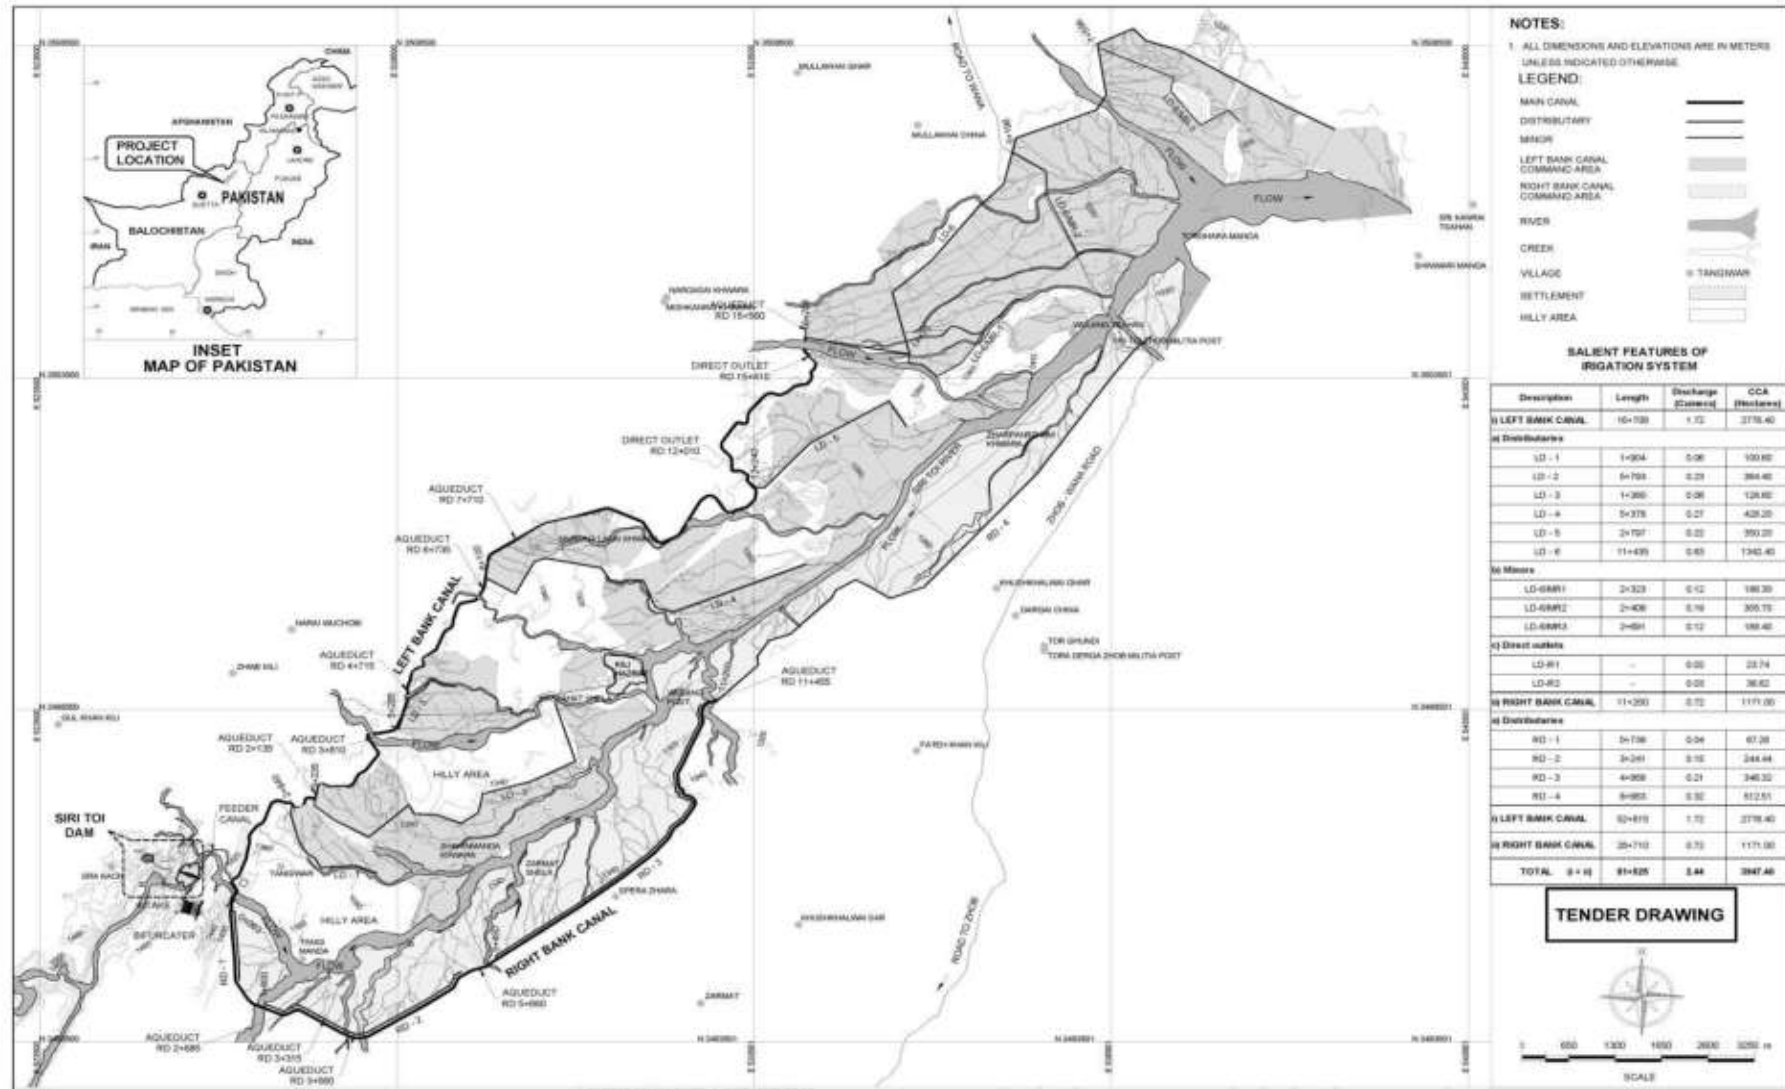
Layout Plan of Proposed Project Interventions(Detail Design Stage)
